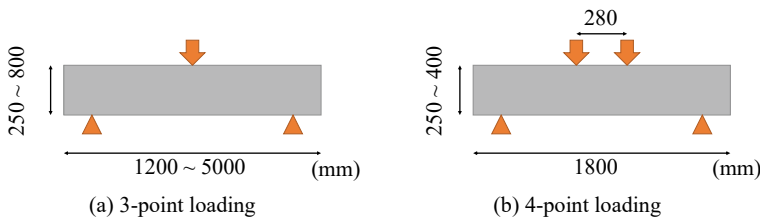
Schematic diagram of RC beam specimen under (a) 3-point loading and (b) 4-point loading
